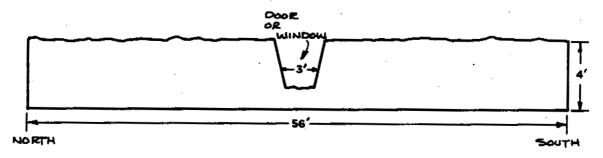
Elevation of East Outside Wall at Sand Springs Station
